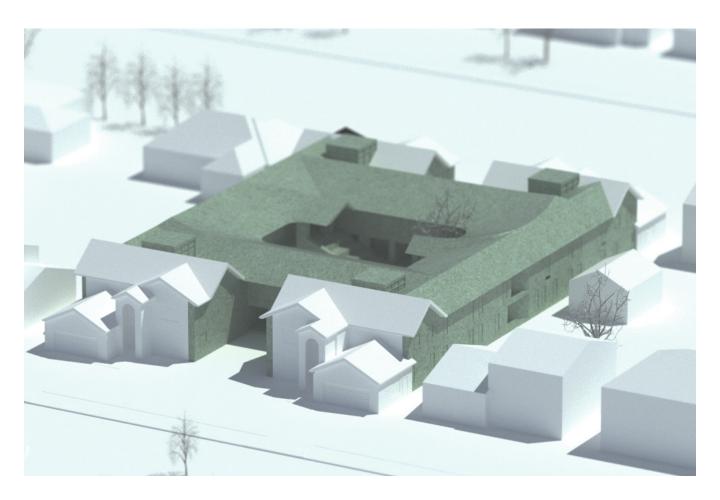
Sterling Heights McMansions Expansion massing depicting unchanged street side elevations with new proposed interior fill. Author.
